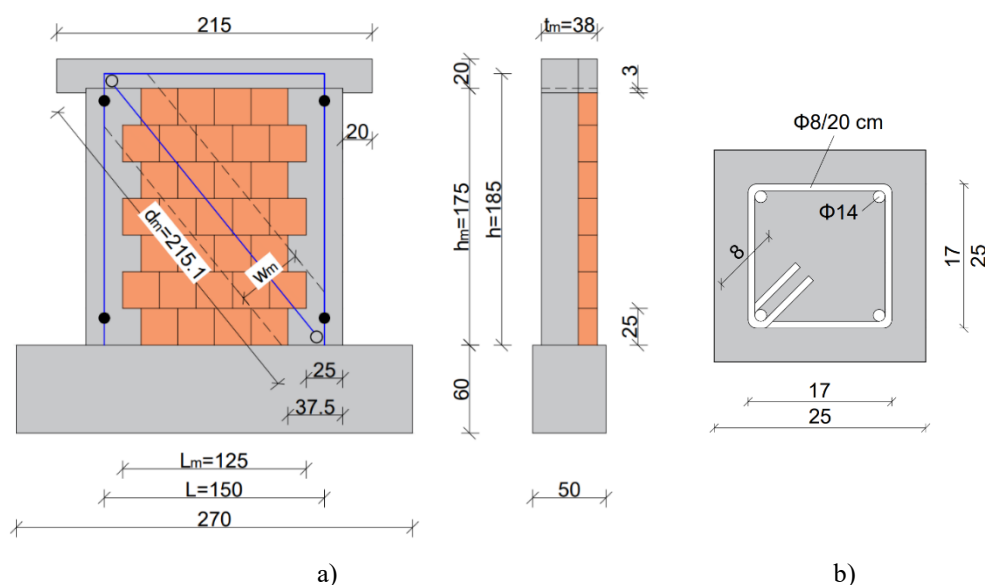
a) CM wall test specimen (dimensions in cm); b) Tie-column reinforcement [1].
